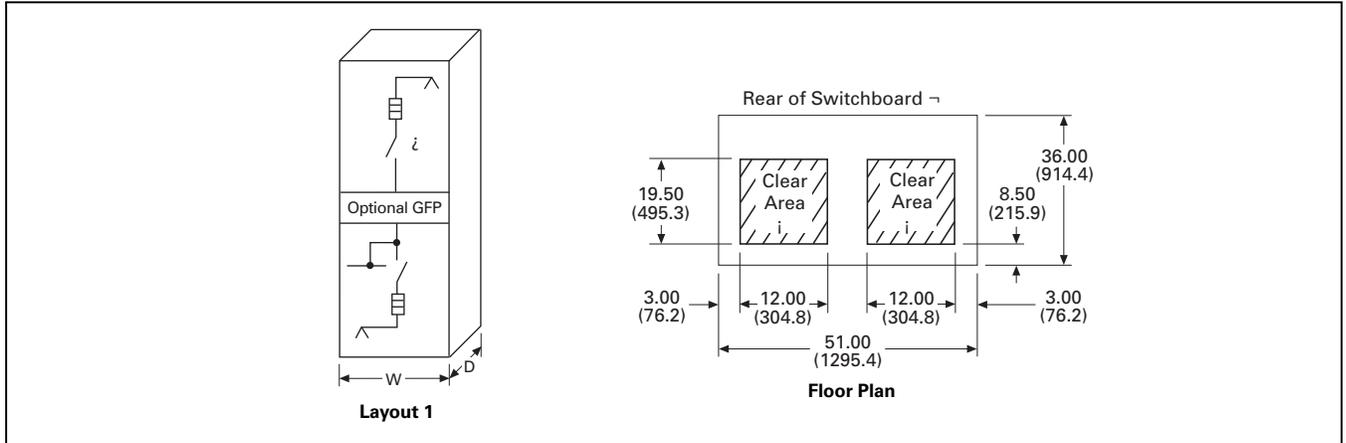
Individually Mounted Feeder Layout—Dimensions in Inches (mm)
